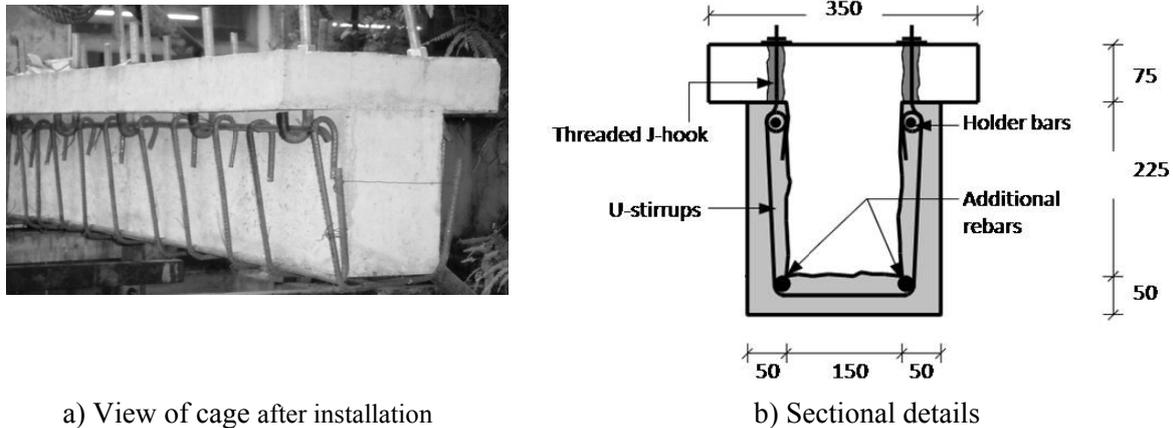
Reinforcement cage for the concrete jacket (All dimensions are in mm)
